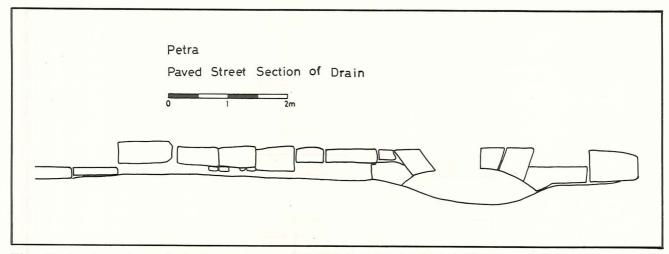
Section of the drain in the paved street (after Ali Da'jah).
